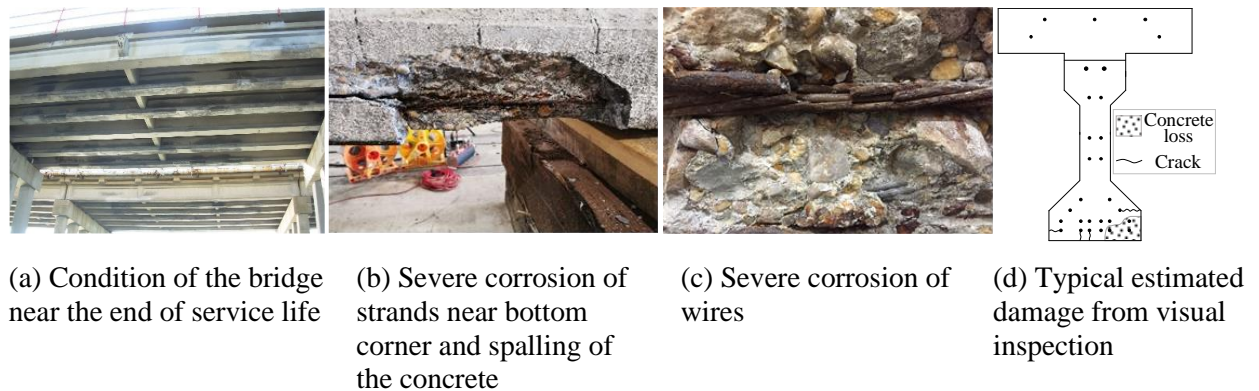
Corrosion-induced damage in the I-section girder
